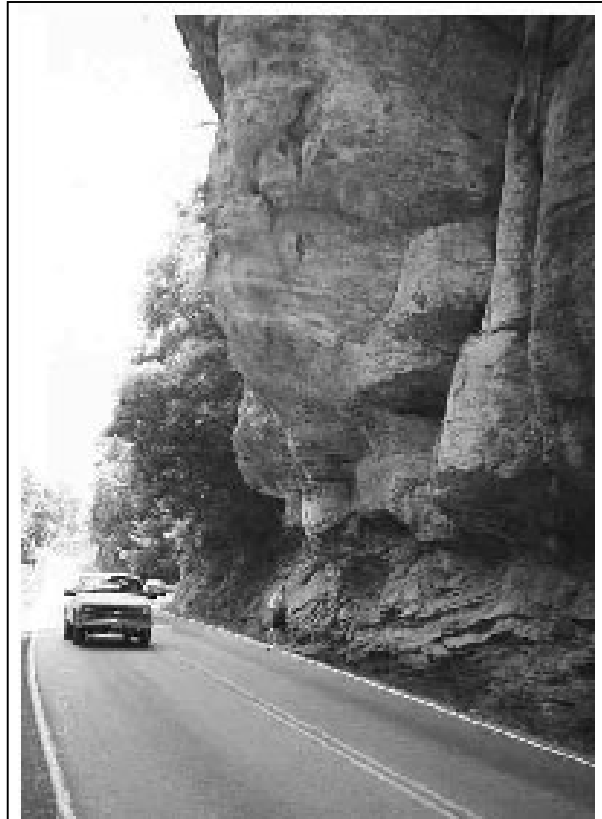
The ditch at this site is ineffective in retaining rock fall and preventing spillage onto the roadway.
